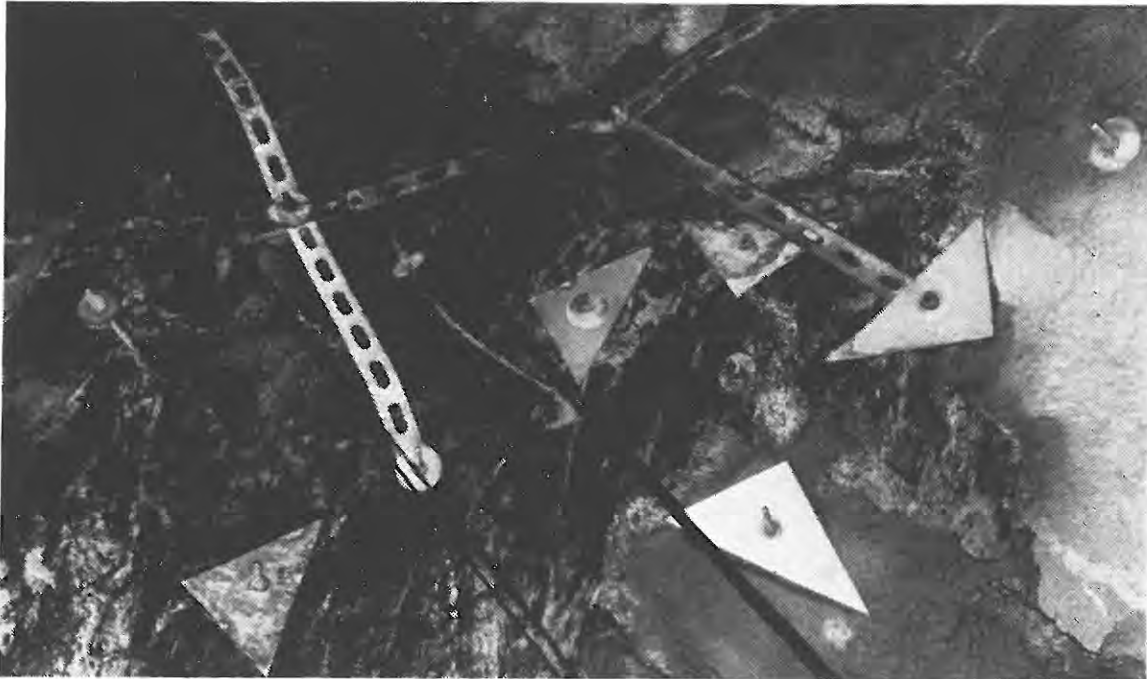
Delamination and spalling of the shotcrete lining
